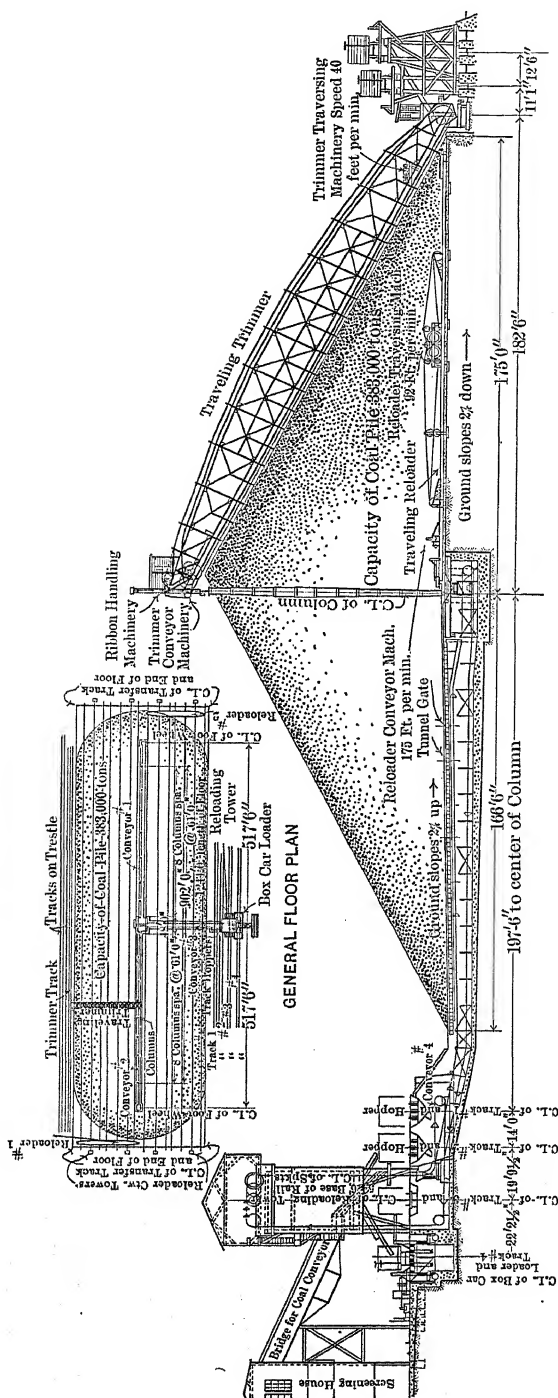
RANSOM PLANT, LEHIGH VALLEY COAL CO. PLAN AND CROSS-SECTION.
